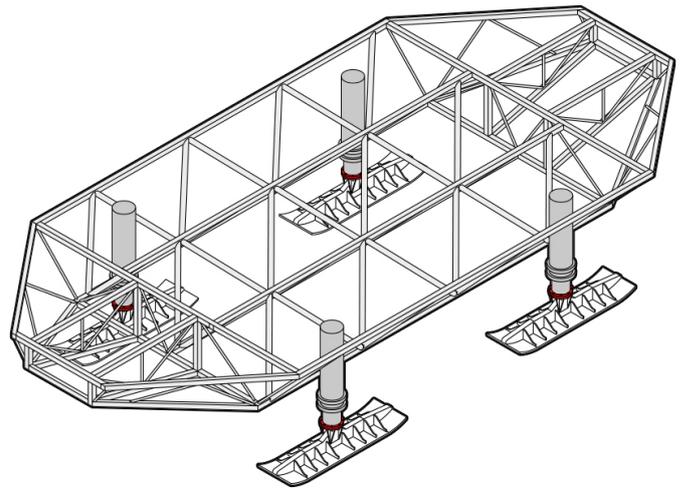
Module of structure construction- stage 2 Hydraulic legs and skis installed. Original author
